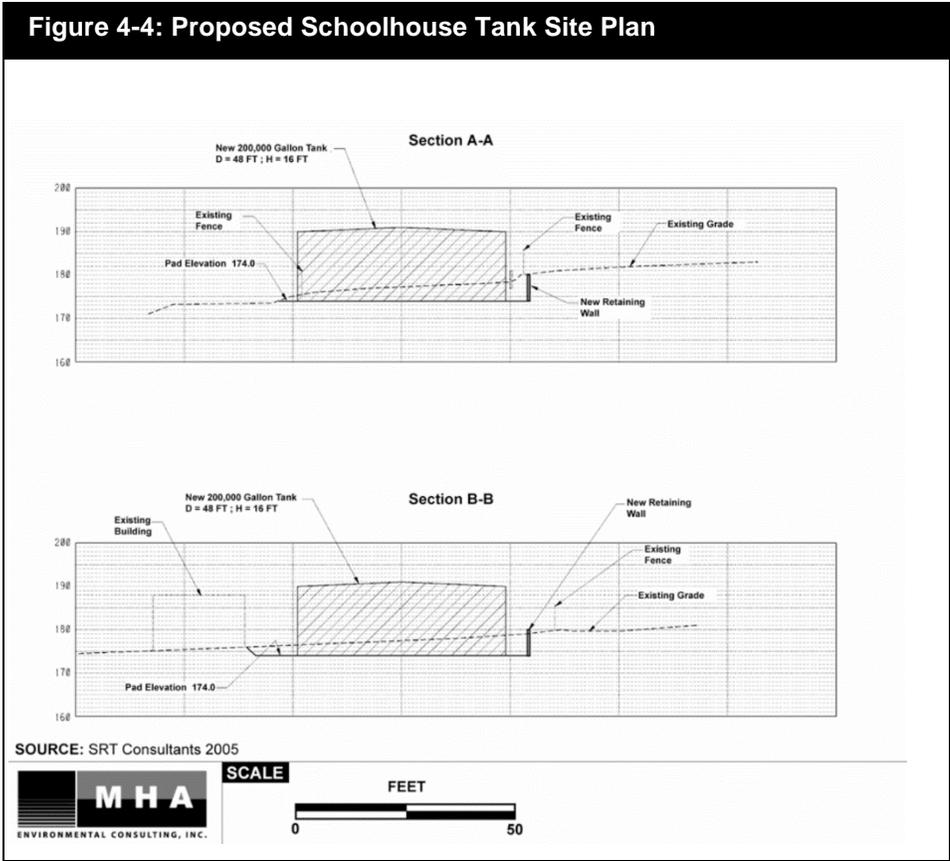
Proposed Schoolhouse Tank Site Plan
